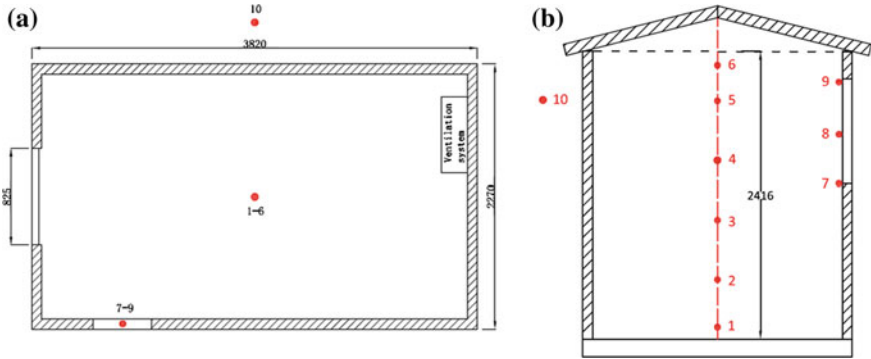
a Plan view of technical shelter and positions of thermocouples; b cross-section of technical shelter and positions of thermocouples
